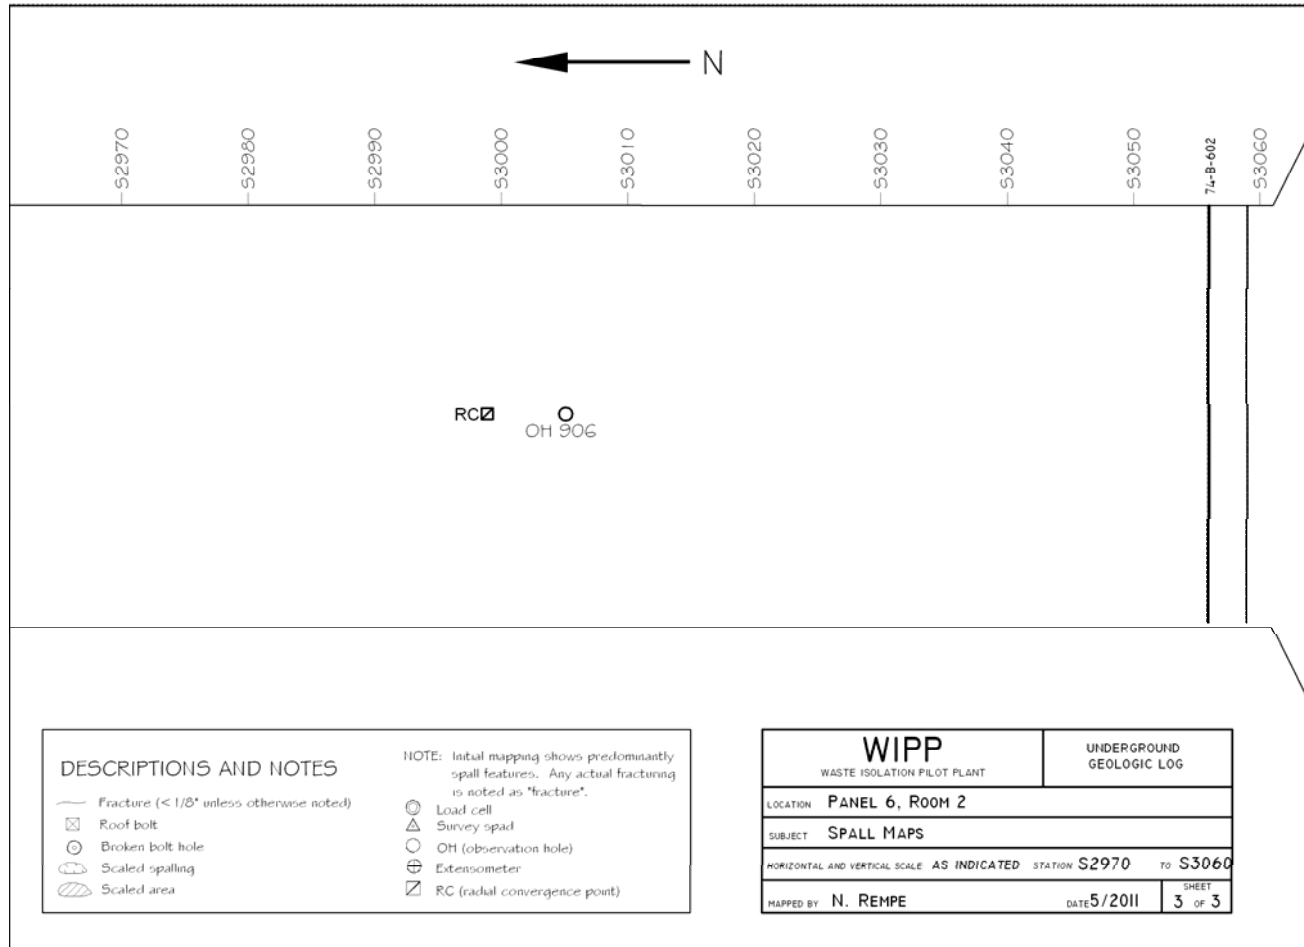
Panel 6 Room 2, S2770-S3060 Roof Fractures (Sheet 3 of 3)
